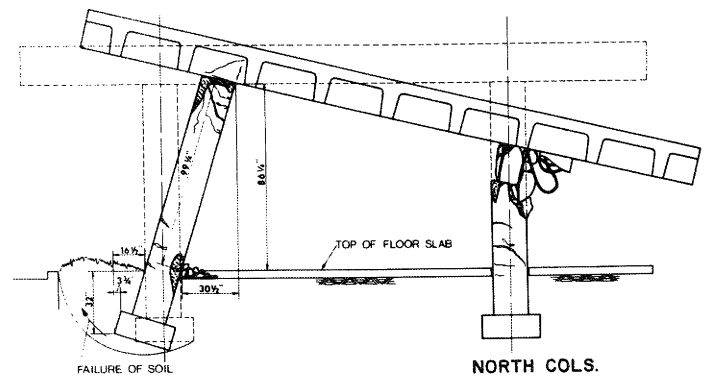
SCHEMATIC ILLUSTRATING FAILURE OF CANOPY
